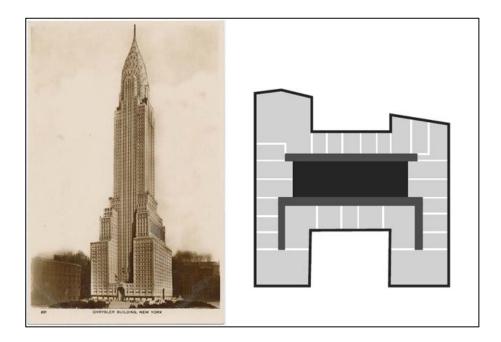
Chrysler building- general view and typical floor plan (google images)
